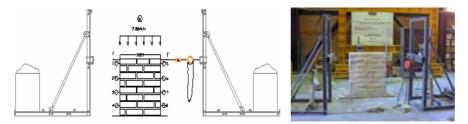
In-plane cyclic testing layout: wall specimen; reaction frames; horizontal displacement transducers; dynamometer; and horizontal loading system.
